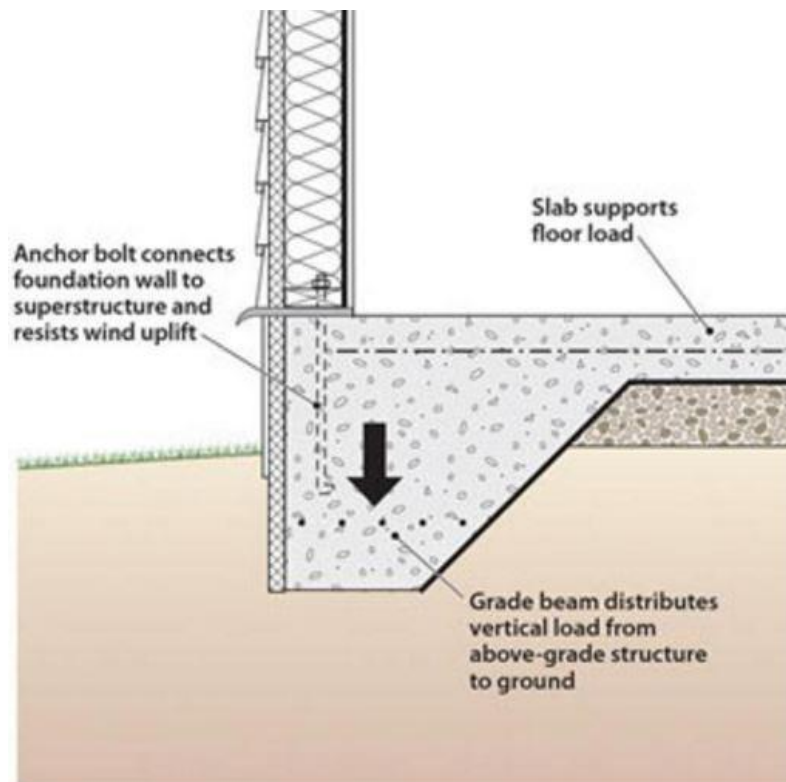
, Structural components of Raft foundation with grade beam, www.thefoundationexpert.com
